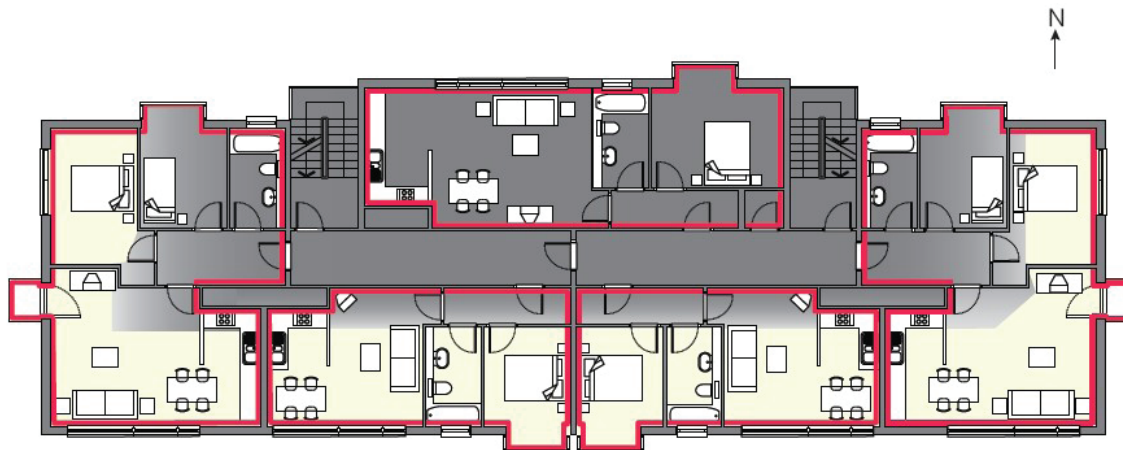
Careful layout design means that four out of the five flats shown have a south-facing living room
